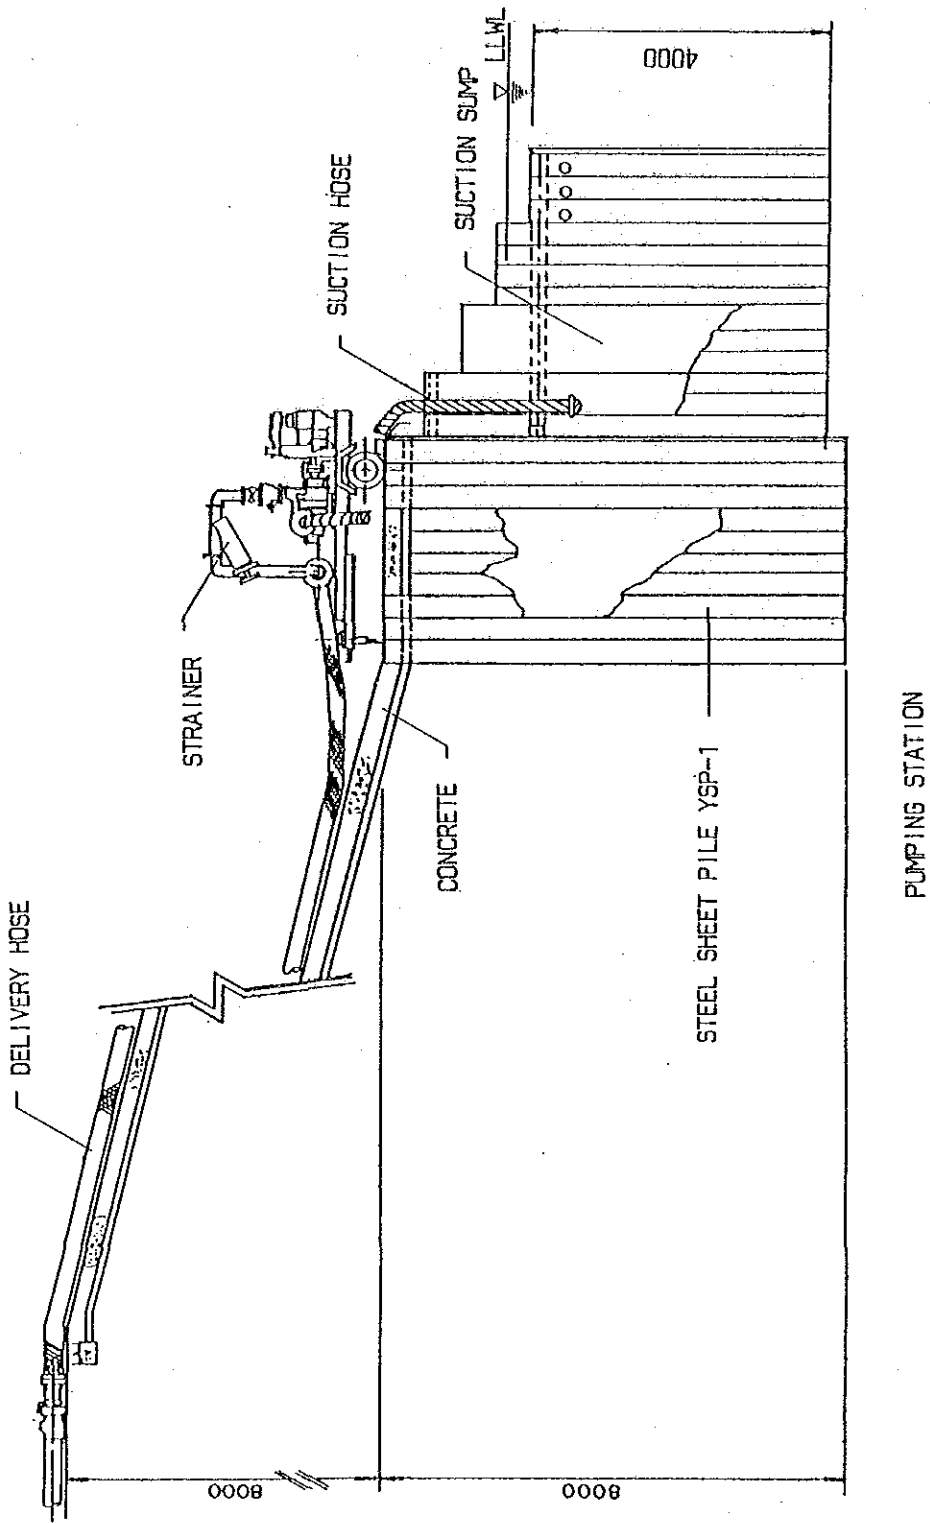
GENERAL PLAN OF PUMP SYSTEM (ILAGAN MF)
